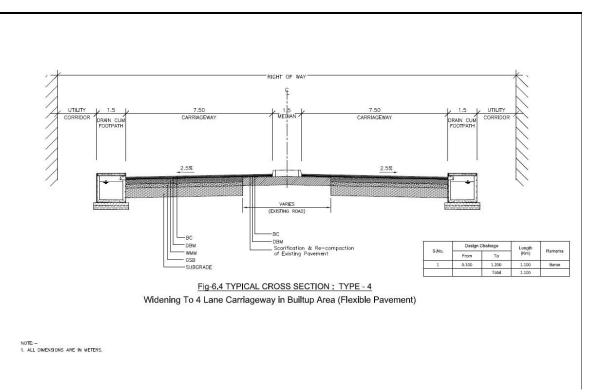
Typical Cross Section (Type-4) Widening to 4-Lane Carriageway in Built up Area (Flexible Pavement)
